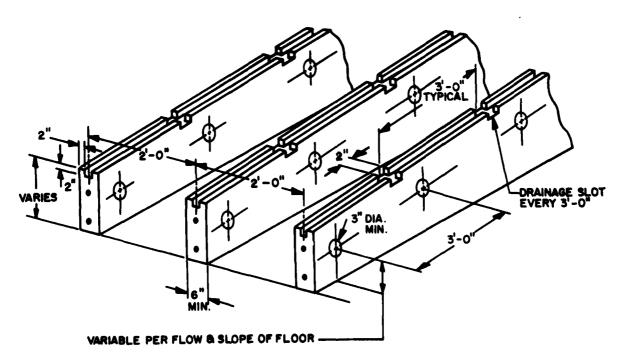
Cast-in-place beam construction. (From Drawing 3, Information Bulletin [B. F. Goodrich].)
